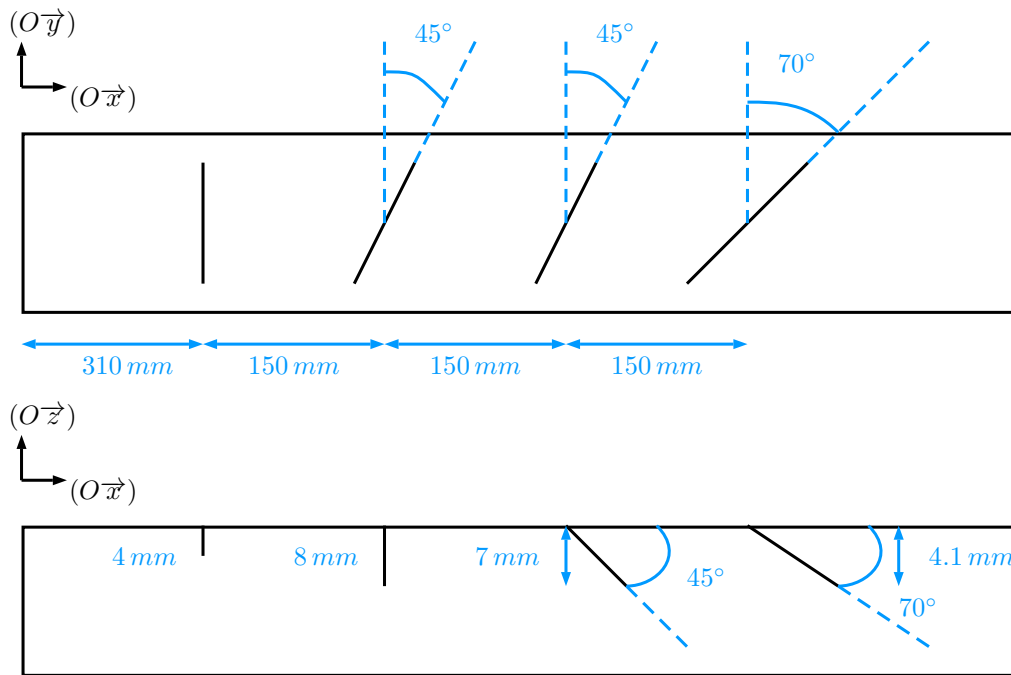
Top view and cross longitudinal views of the 1 m rail with machined defects.
